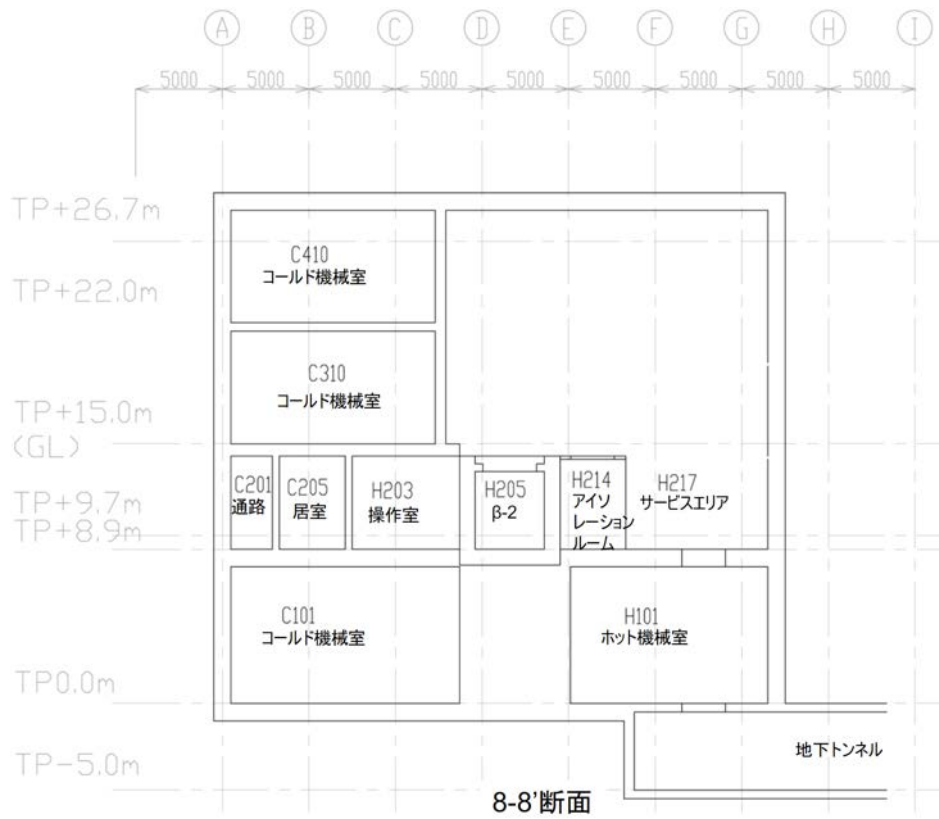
Elevation view of PIE facility (8-8').
